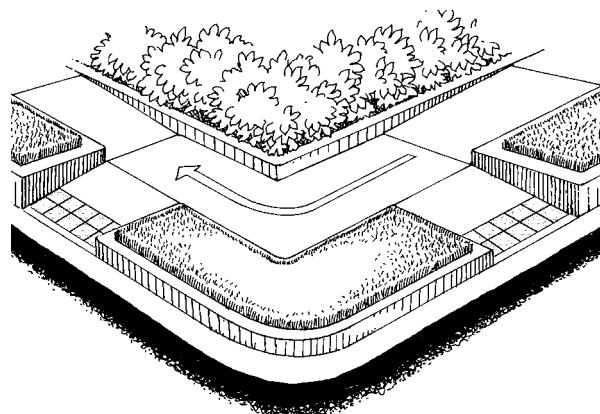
Combined parallel and perpendicular curb ramps lowers the elevation of level landings while bridging the remaining elevation gap. This recommended design is very accessible but can be expensive to install in some retrofit installations.
